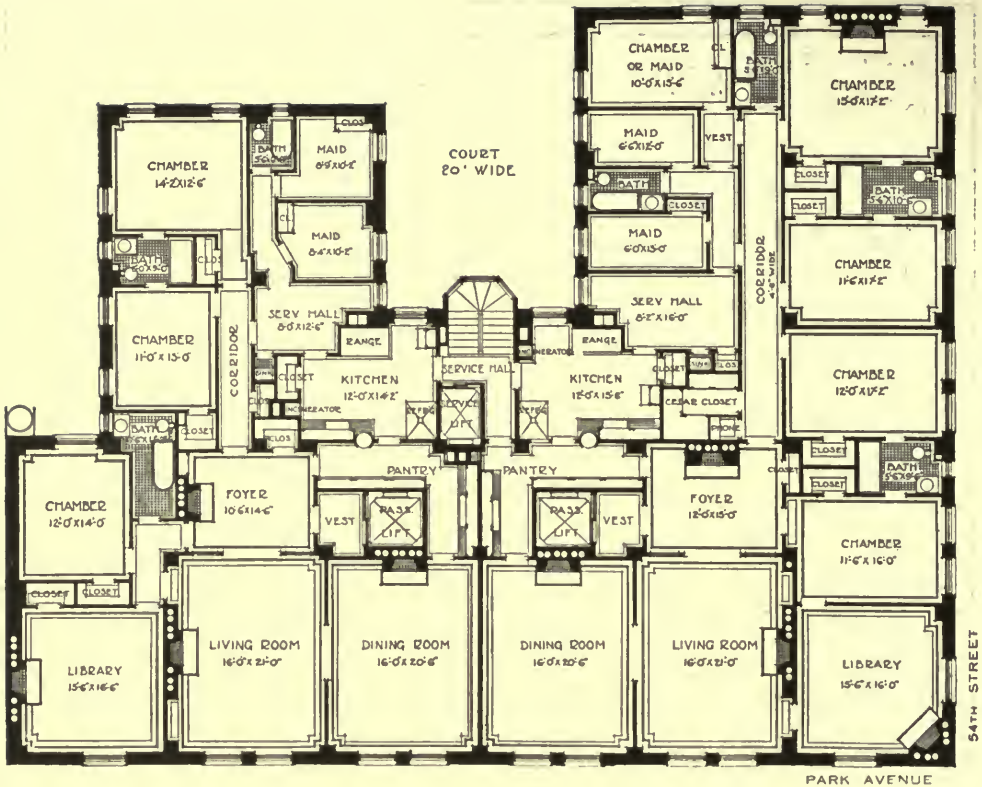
TYPICAL FLOOR PLAN—NO. 405 PARK AVENUE, NEW YORK CITY.
